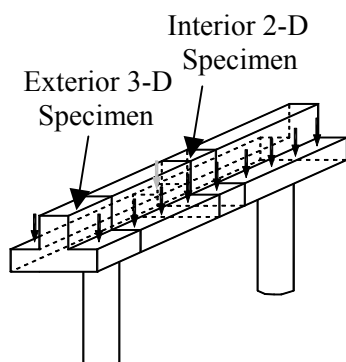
An inverted "T" bent cap showing an exterior 3-D specimen and an interior 2-D specimen
